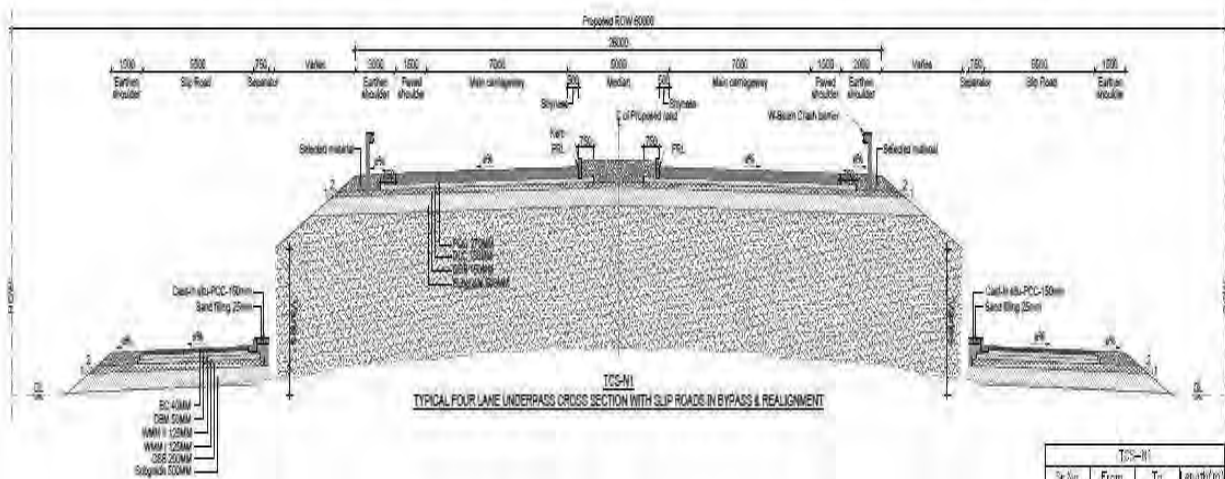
TCS-N1 Typical Four Lane Underpass Cross Section with Slip Roads in Bypass & Realignment
